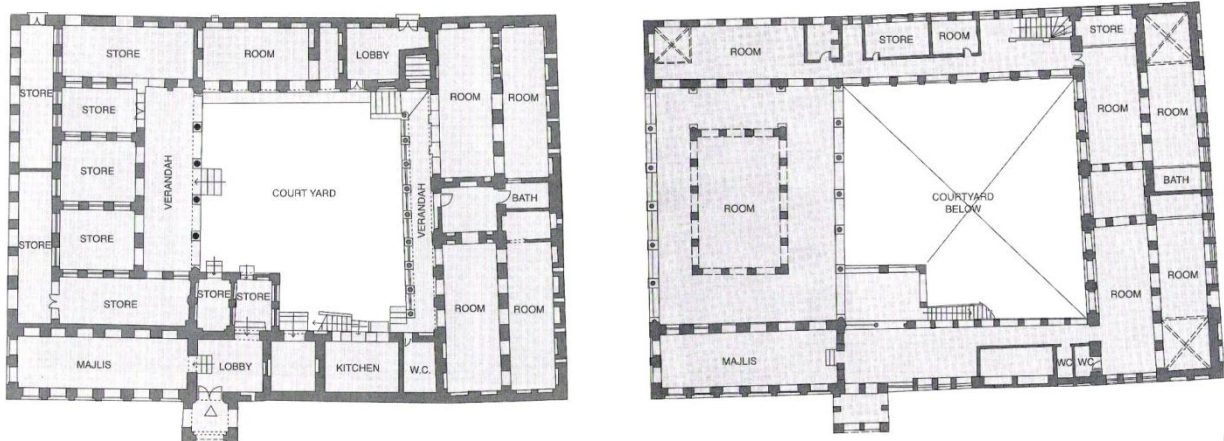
Figure D: First and second floor plans of courtyard housing typologies. (All drawings in this page are from Elements of Traditional Architecture in Dubai, 2000)
